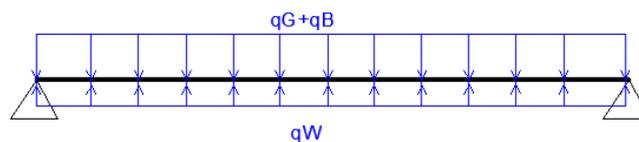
26. Gate resting on vertical supports modeled as a beam
